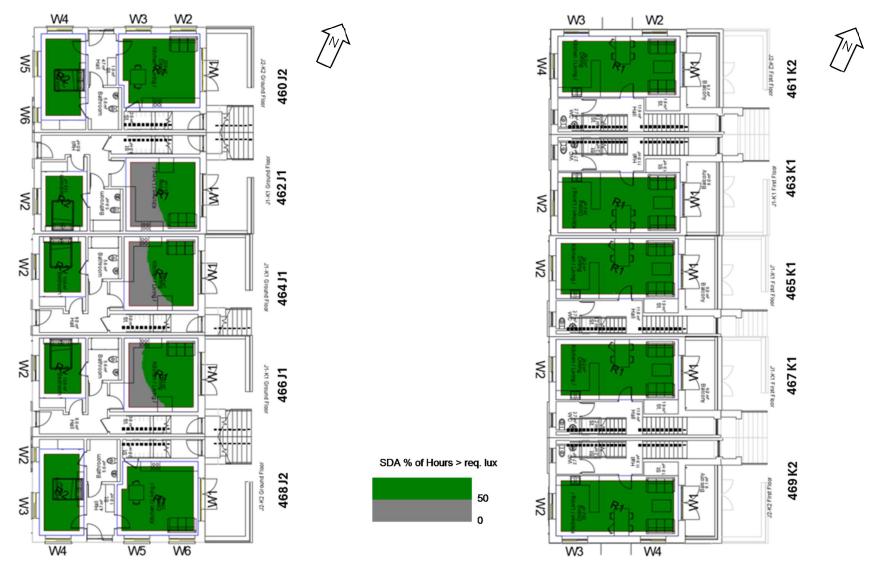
Apartment 462-466 J1 & 460-468 J2 Ground Floor sDA Contours
